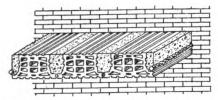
Combination floor of hollow tile, reinforcing bars and concrete beams, forming a built-up floor slab. There is no thrust to this type of floor.
